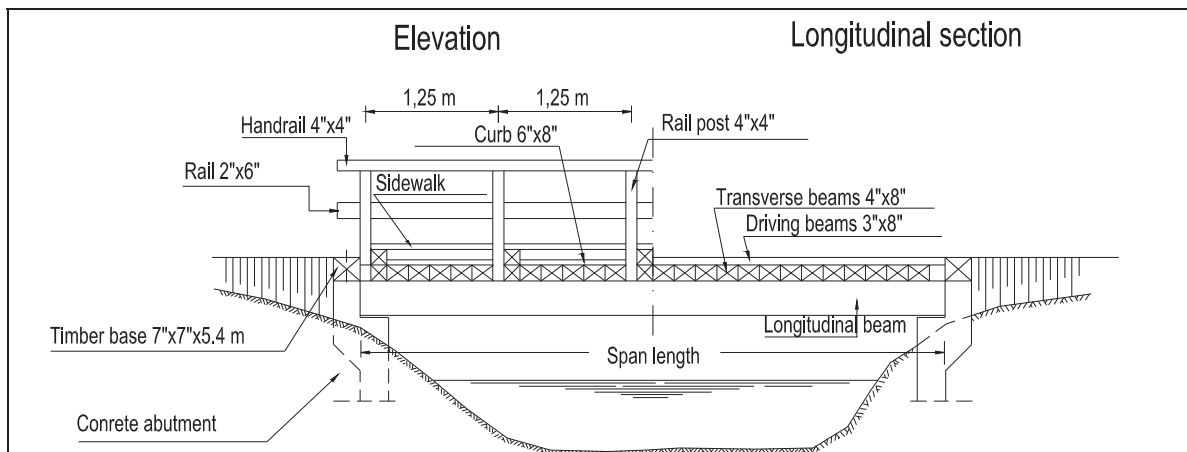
Elevation and longitudinal section of a standard Chilean timber bridge [3]
